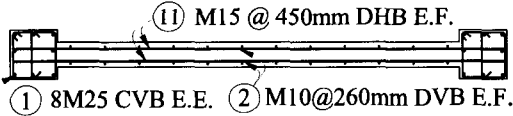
Modeling of shear wall sections for B6 located in Montréal
